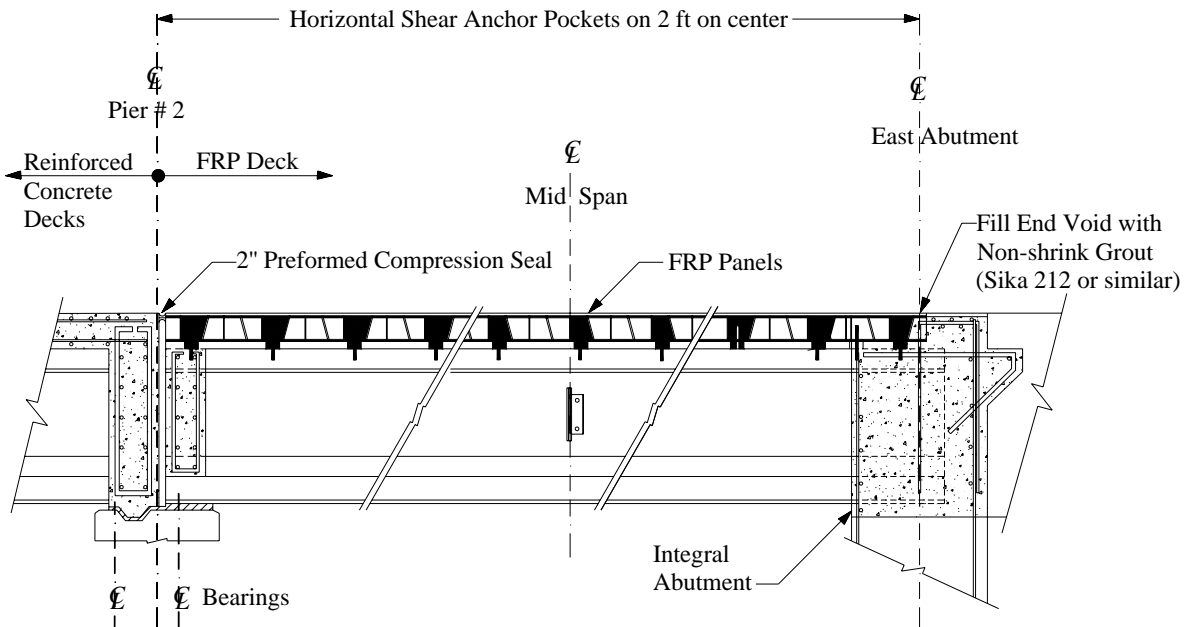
Longitudinal Cross Section of the FRP Deck Span
